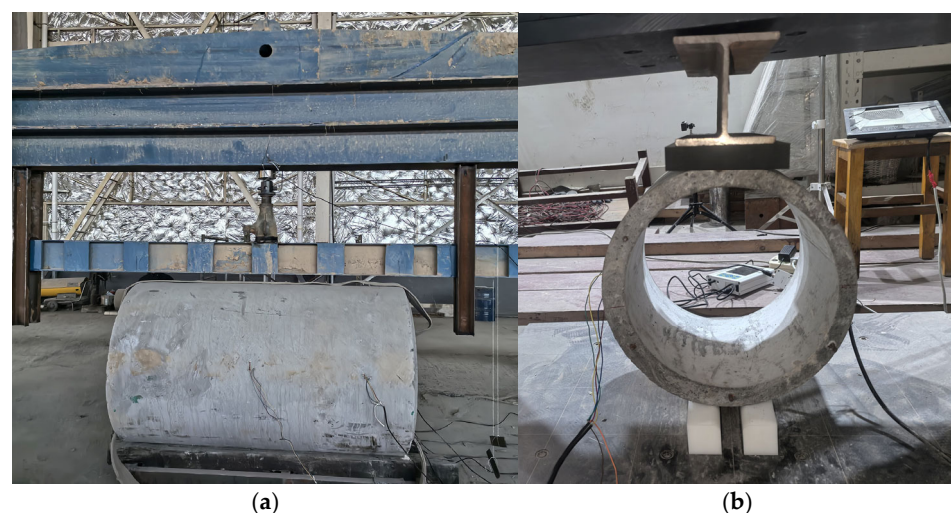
Test setup (a) Test setup for the large-diameter pipe; (b) Test setup for the small-diameter pipe.
